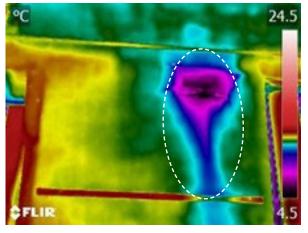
IR image showing air leakage through hole in the main façade wall (west facing)
